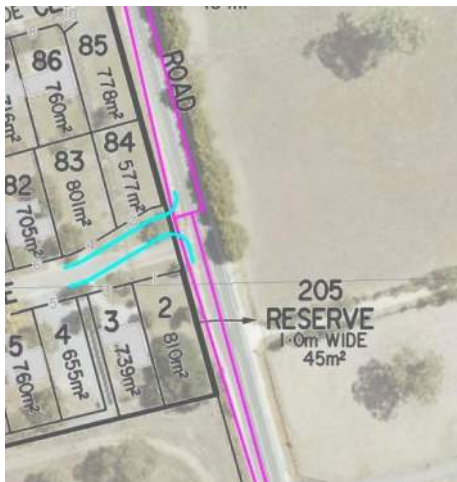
Proposed realignment of Lucknow Avenue intersection with Woodside – Nairne Road.
